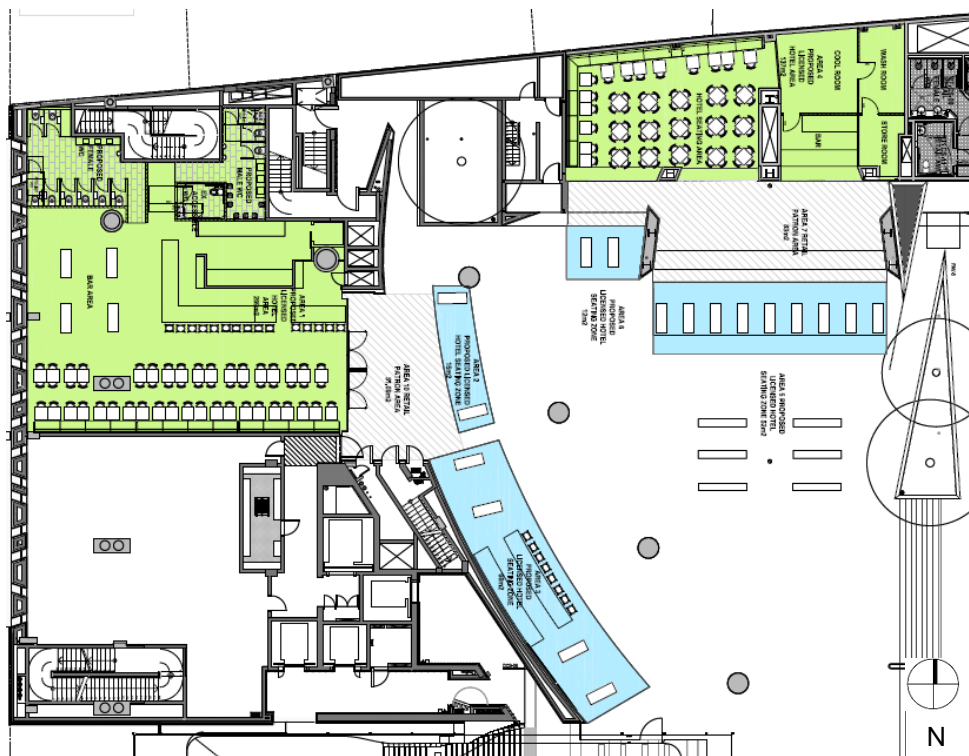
Excerpt of approved plan for Liberty Place Bar under D/2017/725. Note the areas coloured 'blue' are outdoor spaces consistent with the approved outdoor leadable seating zone plan.
